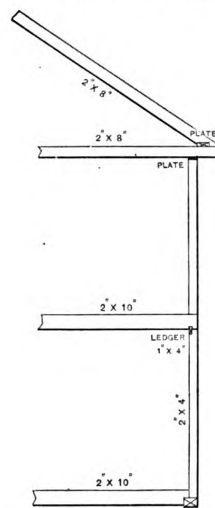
Section Through Building at D, Fig. 7. (right way).
